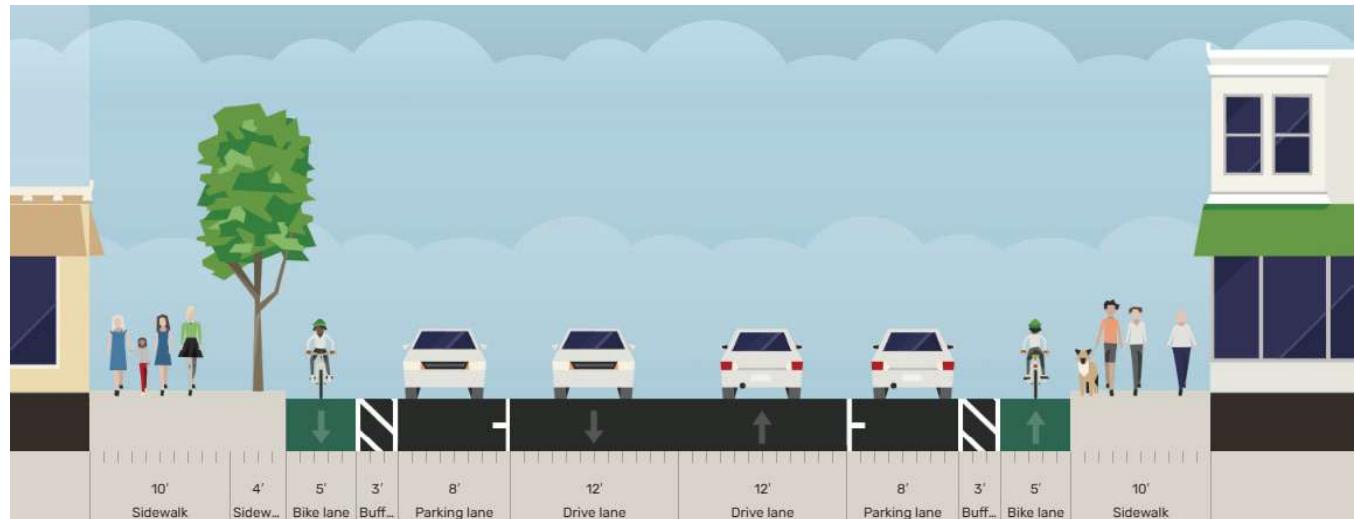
FERRY STREET OPTION 2 – PROTECTED BIKE LANES (OUTSIDE PARKING AREA)
